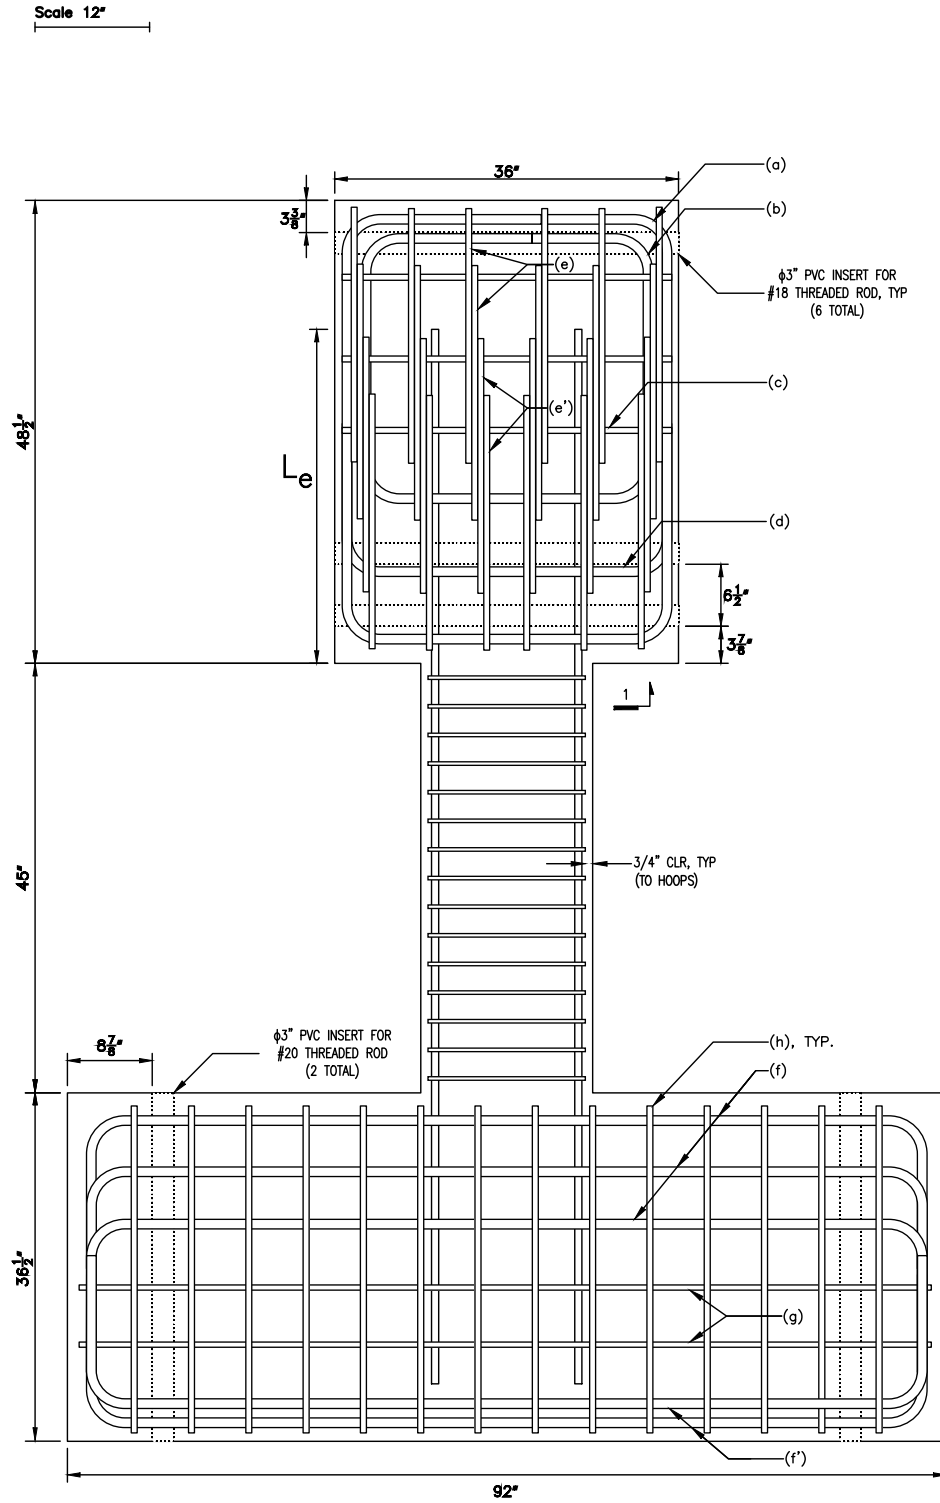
Elevation view of P100-2.5 (1 in. = 25.4 mm)
